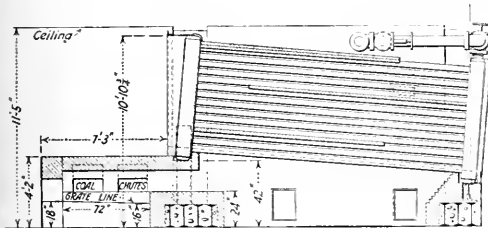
A 375-HP. DRUMLESS EDGE MOOR BOILER AND BURKE FURNACES SET IN HEADROOM OF 11 FT. 5 IN.
